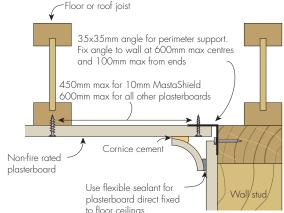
Angle Support For Ceiling to Wall Direct fixed to joist
